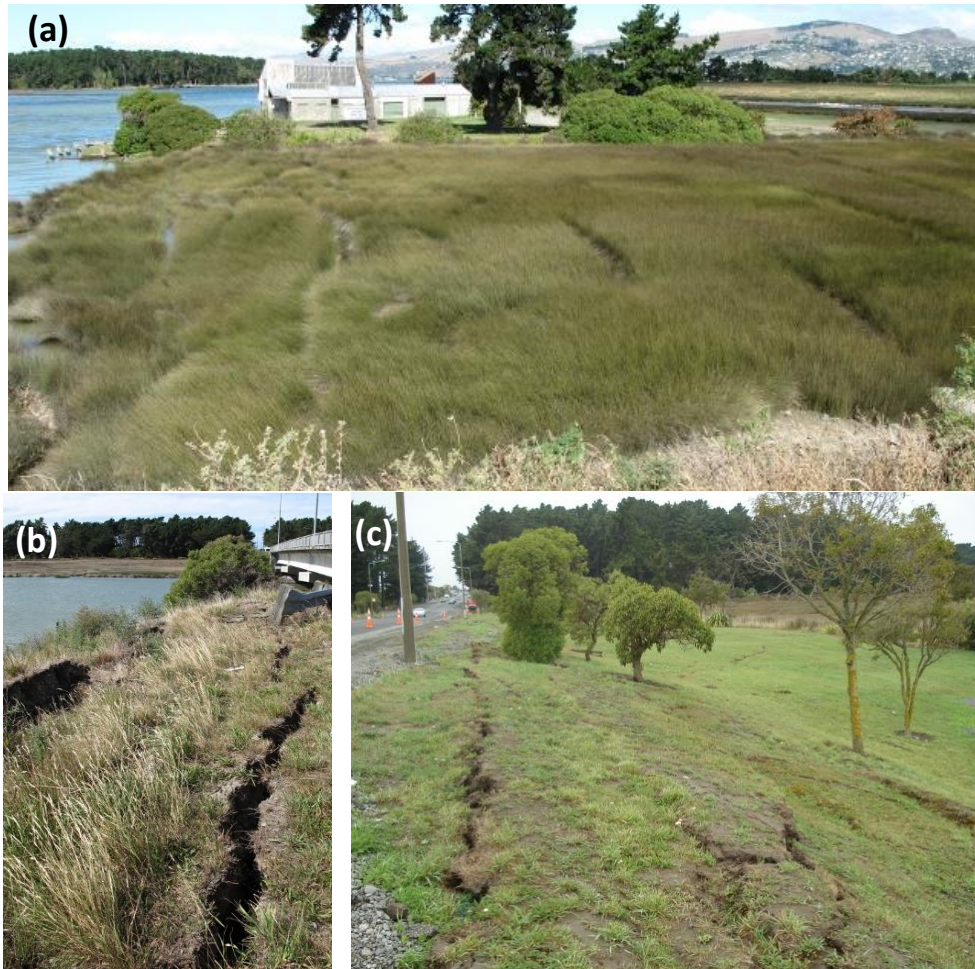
Land damage in vicinity of South Brighton Bridge, (a) lateral spreading cracks through swampland to immediate south of west abutment, (b) sideways slumping/cracking of fill material, north side of west abutment, (c) sideways cracking/slumping of fill approach material, south side of east abutment.
